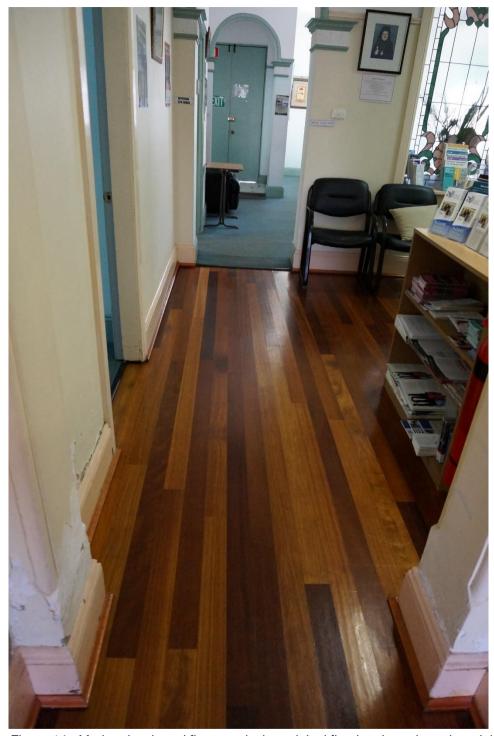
Modern hardwood floors replacing original flooring throughout the original portion of the former house.
